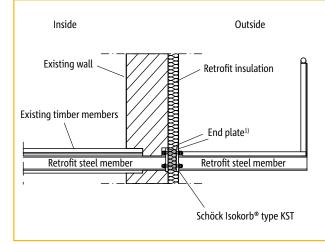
Schöck Isokorb® type KST for a renovation/retrofit balcony installation
